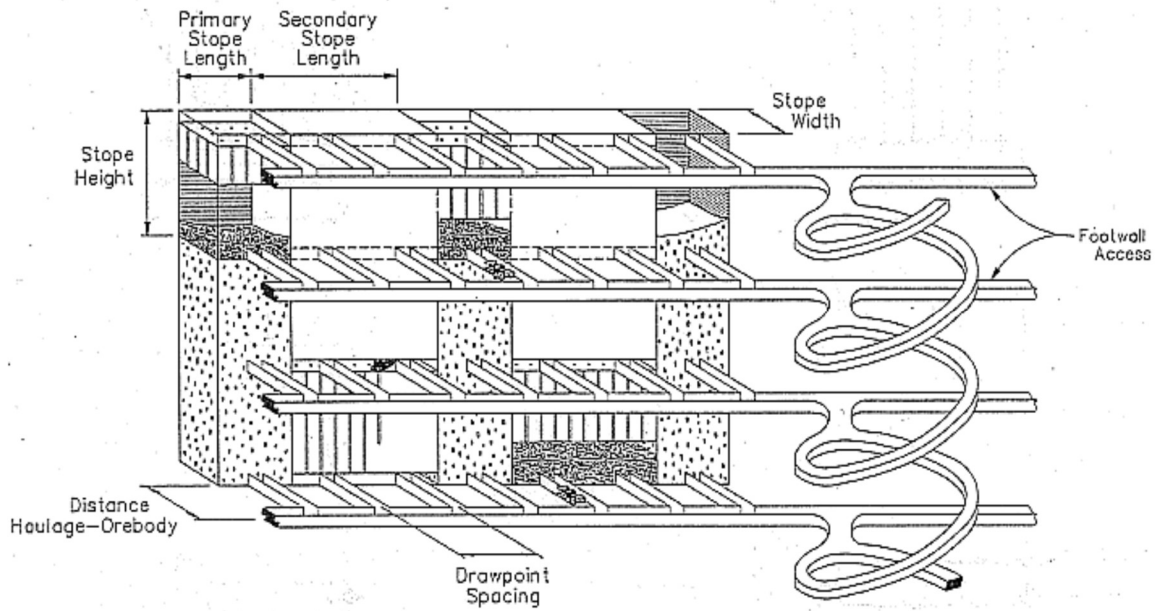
Pillar system around a sublevel around a sublevel overhead stope
